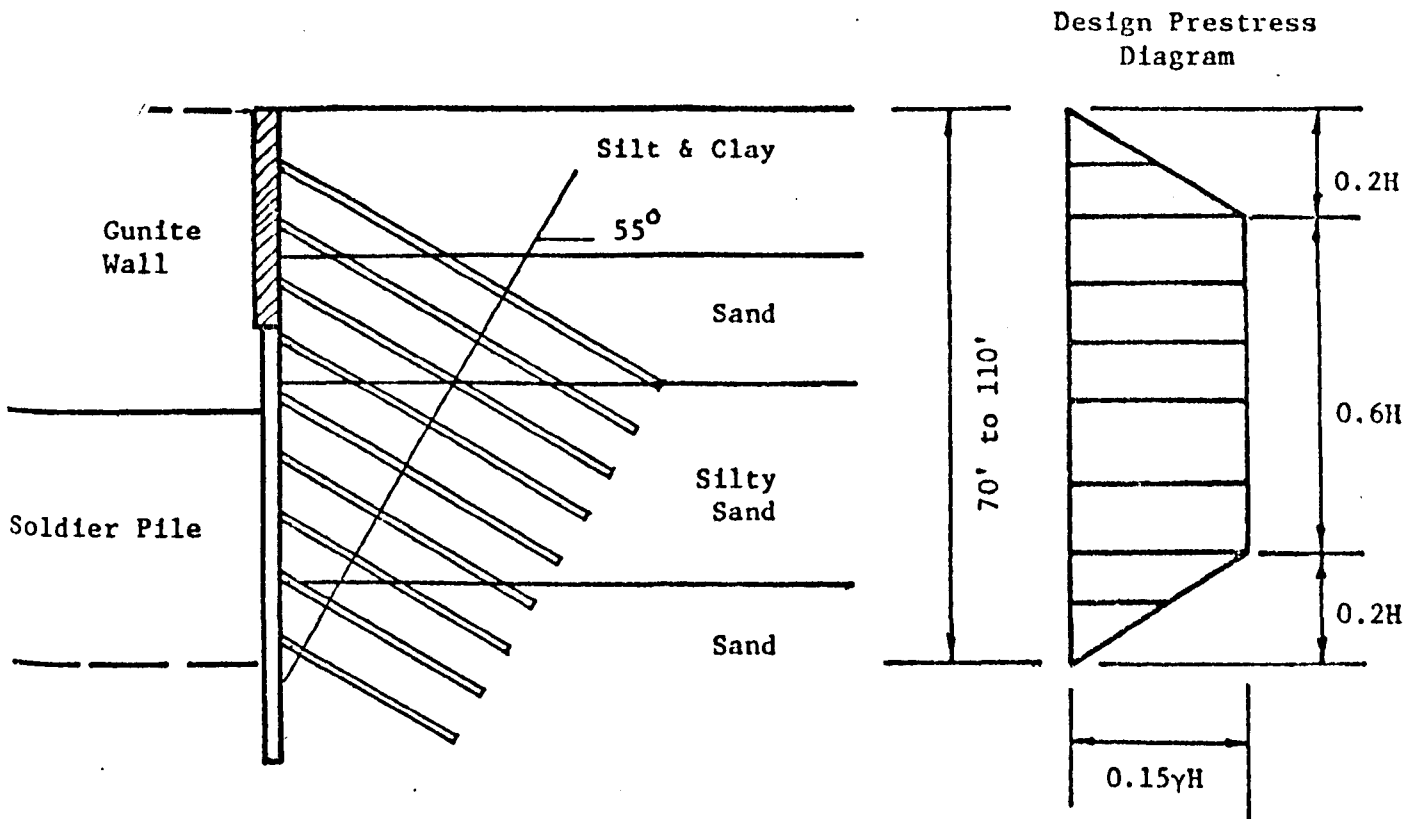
ENTERTAINMENT CENTER AND THEME TOWERS EXCAVATION, LOS ANGELES, CALIFORNIA (After Clough, 1976)
